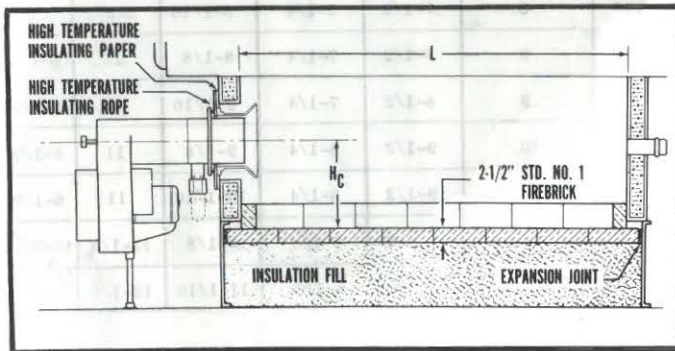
TYPE "F" BURNER INSTALLATION WITH REFLECTOR FRONTPLATE
